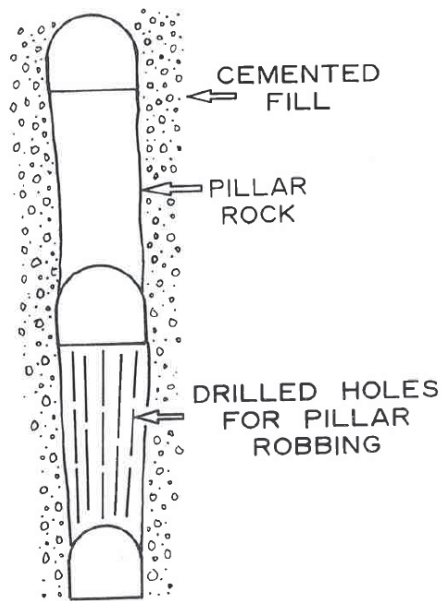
Cross section of secondary stope "pillar" recovery⁴ p.1758
